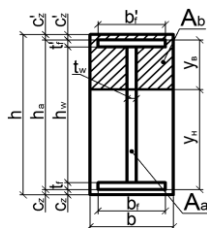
Total reduced section of the rectangular SRC element, the reduced section of the SRC element
